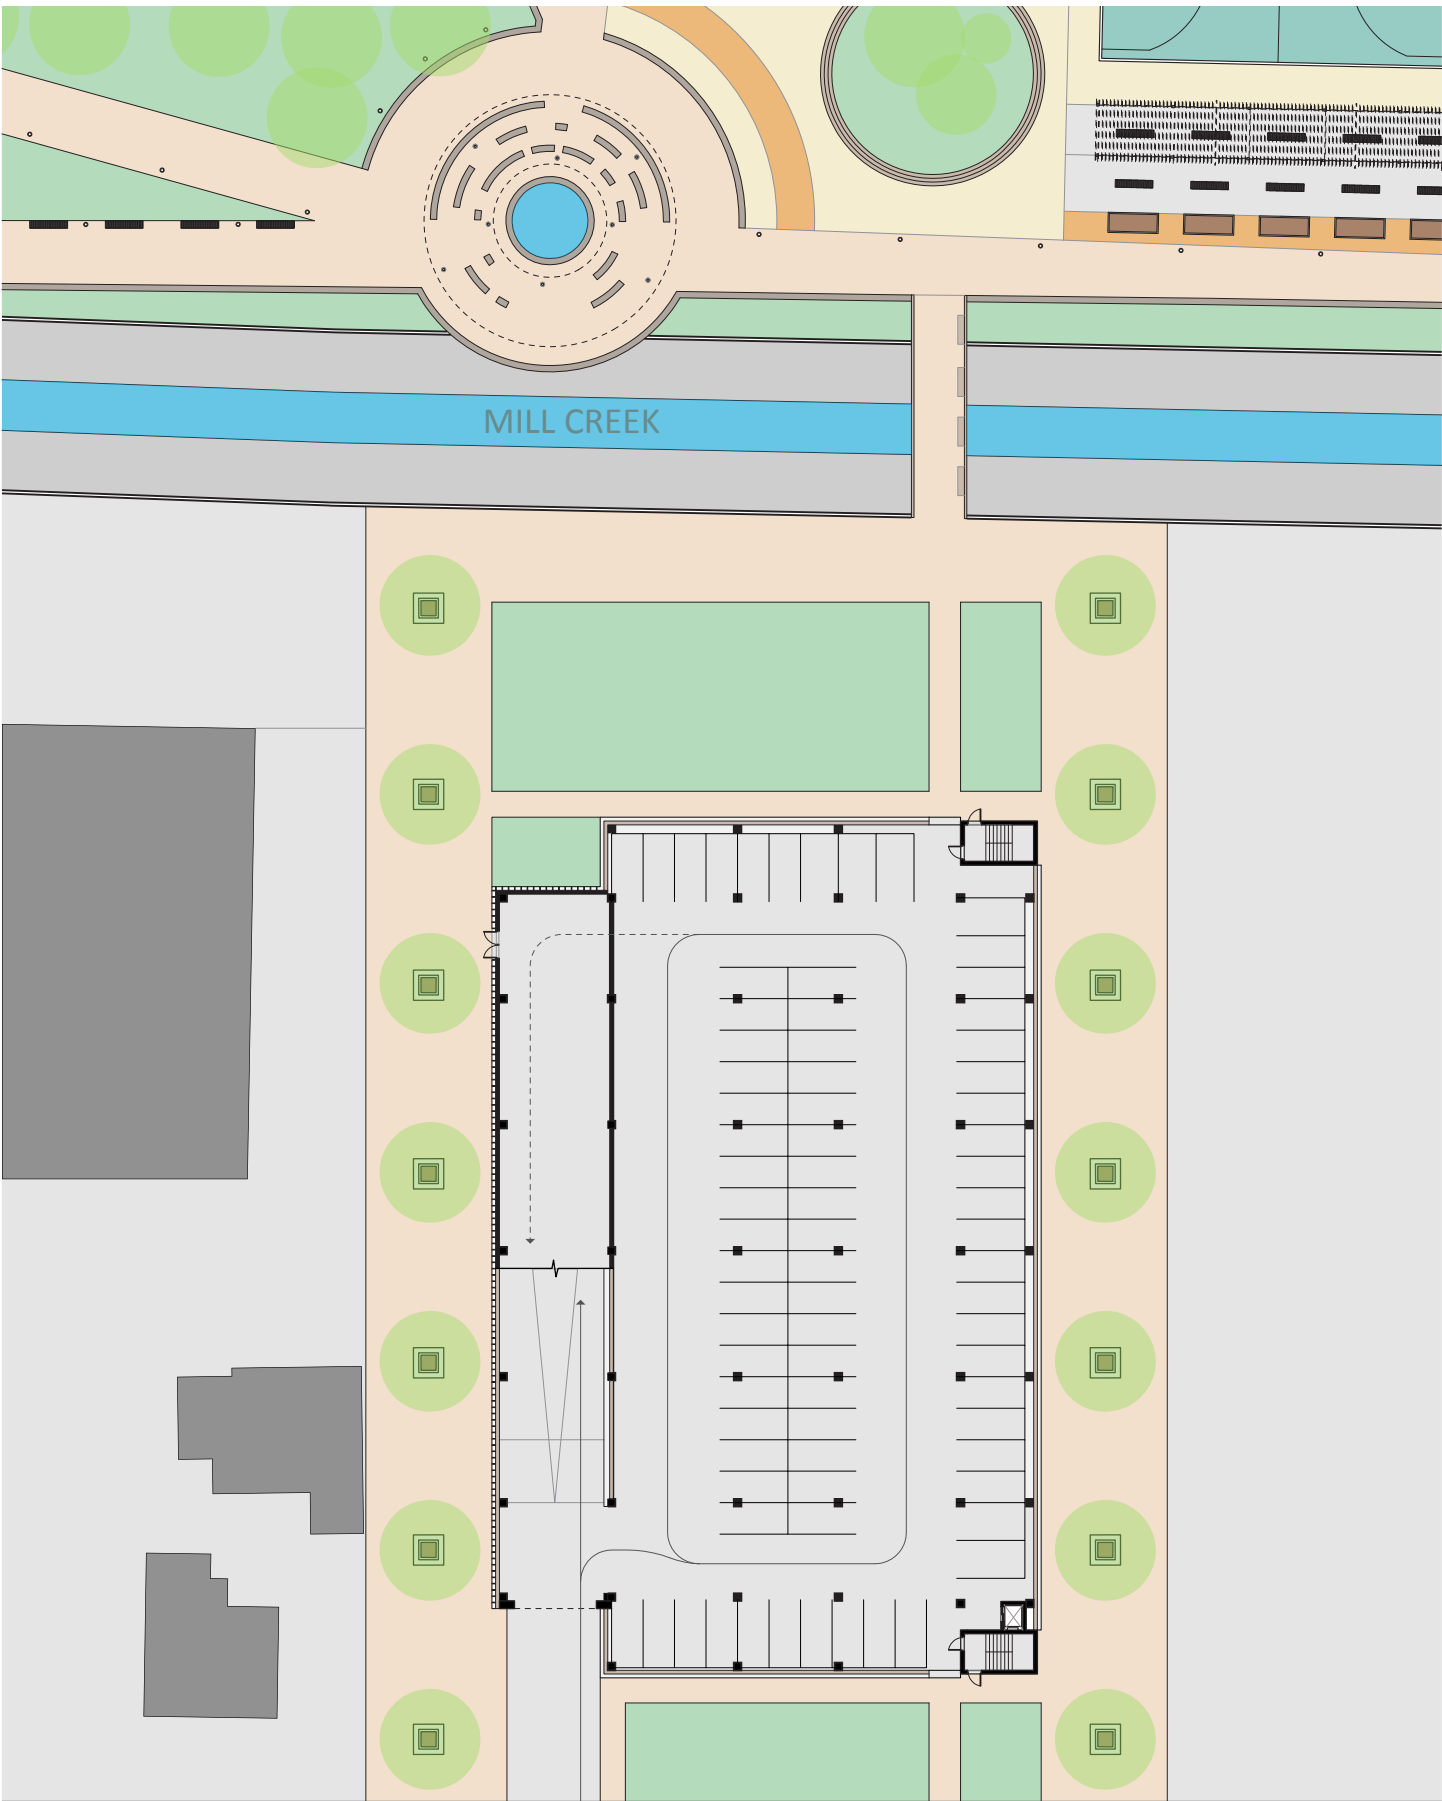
Plan of Mill Creek Gardens parking structure (1:600).
